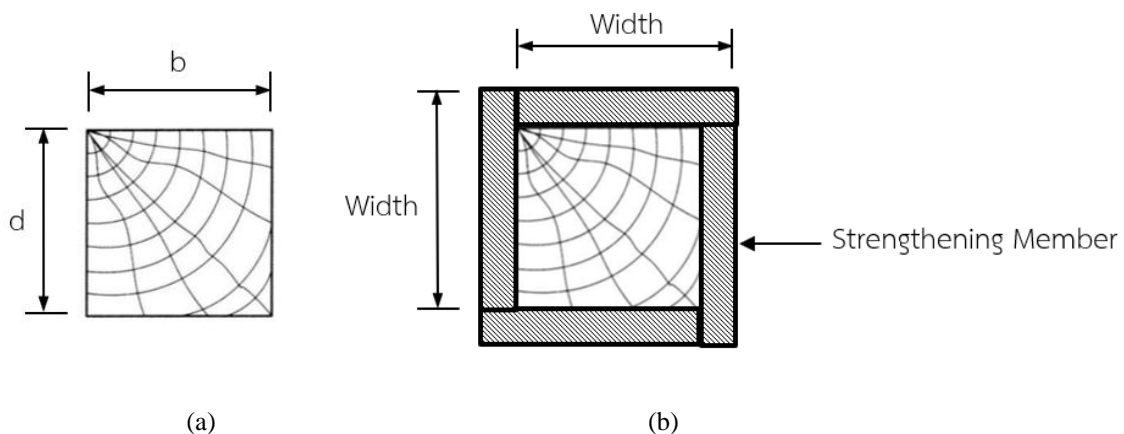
Timber specimen section: (a) original unstrengthen section and (b) strengthening section of typical box built-up.
